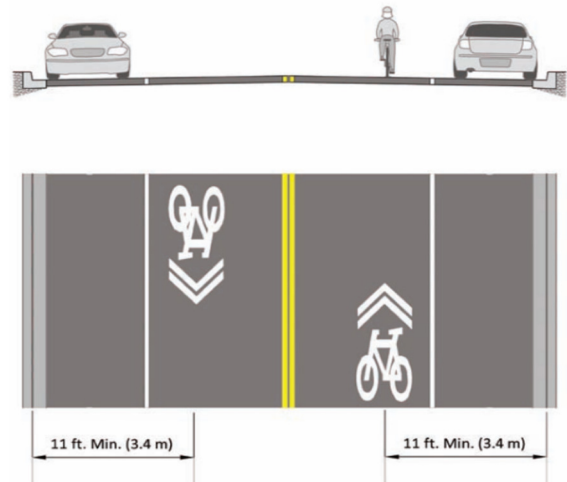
Typical Shared-Lane Marking Cross Section on Street with Parking
